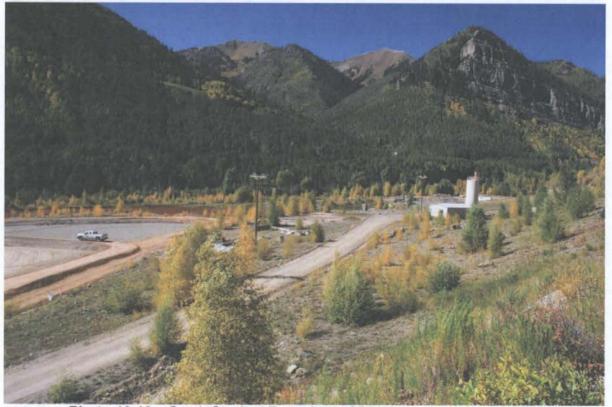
South Stacked Repository (SSR) Area, looking northwest
